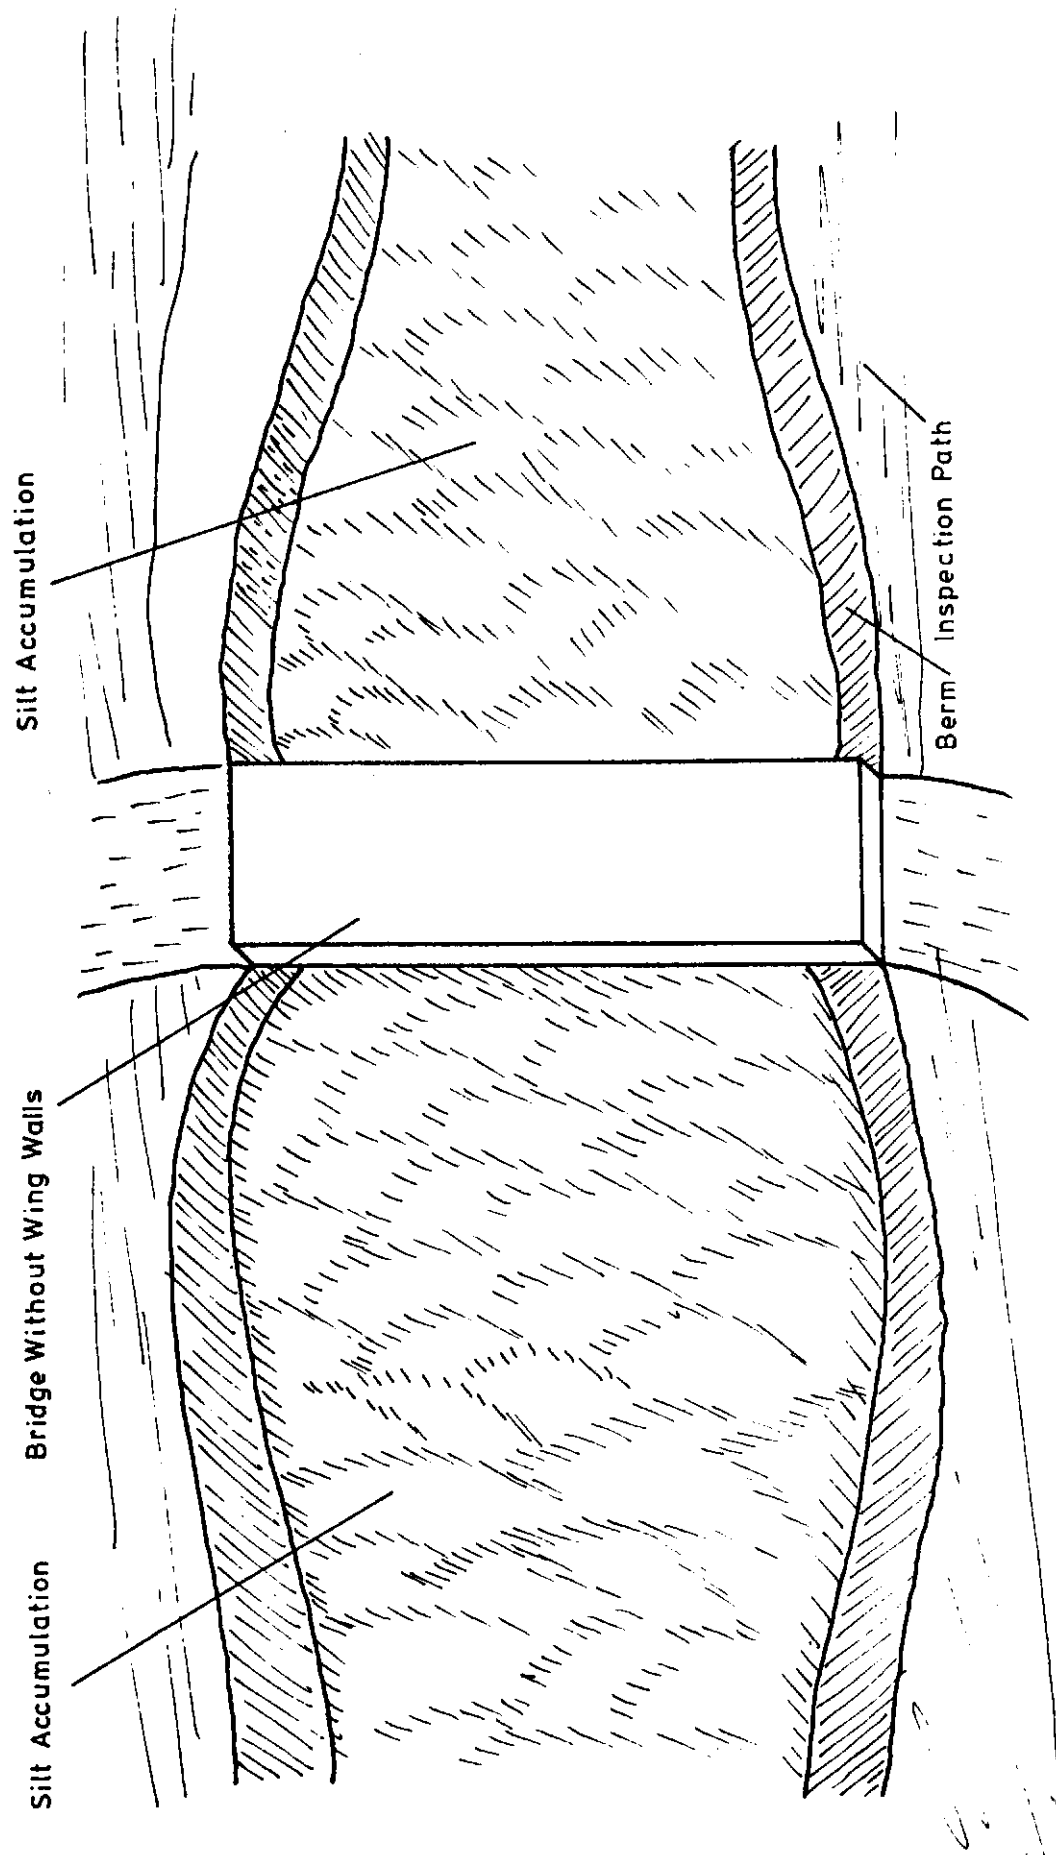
A bridge without wing walls at 8+971 RD of Dhoro Naro Minor.
